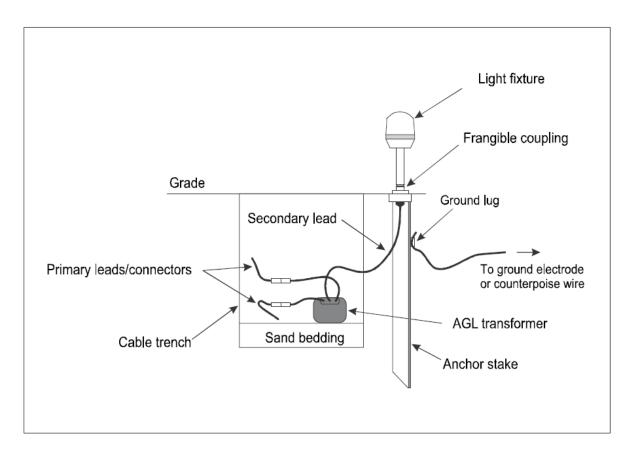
Direct burial of AGL transformer with stake-mounted light fixture
